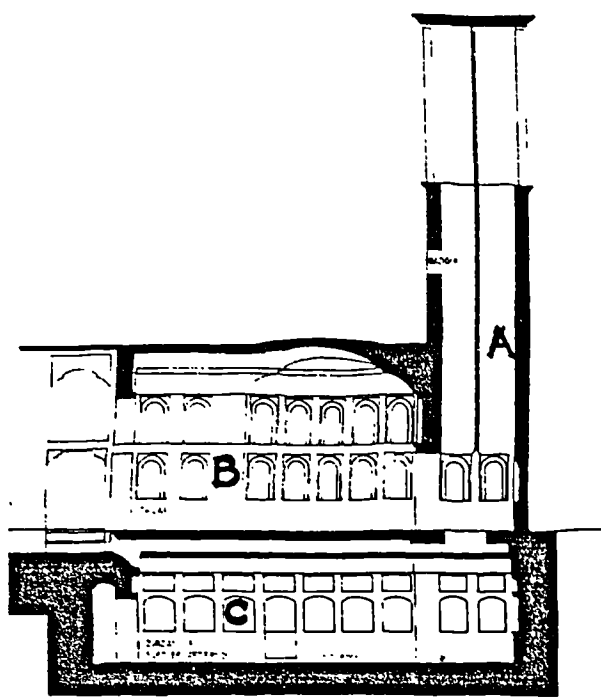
Section through the badgir and summer rooms of house C, showing A) the badgir shaft B) the ground floor summer talar and C) the basement summer room.
